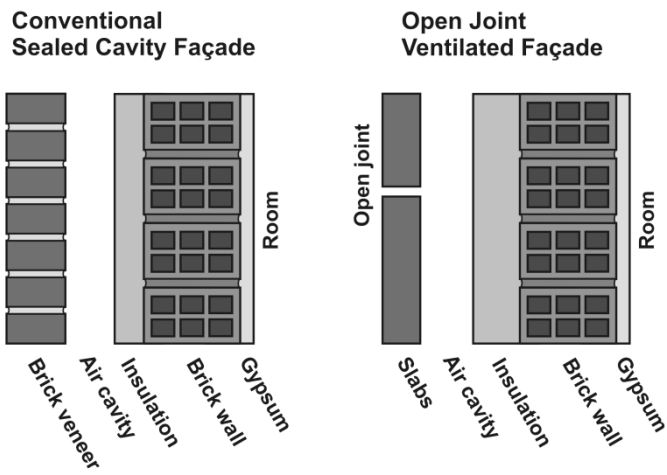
Typical cross section of a sealed cavity and an open-joint ventilated façade (OJVF)
